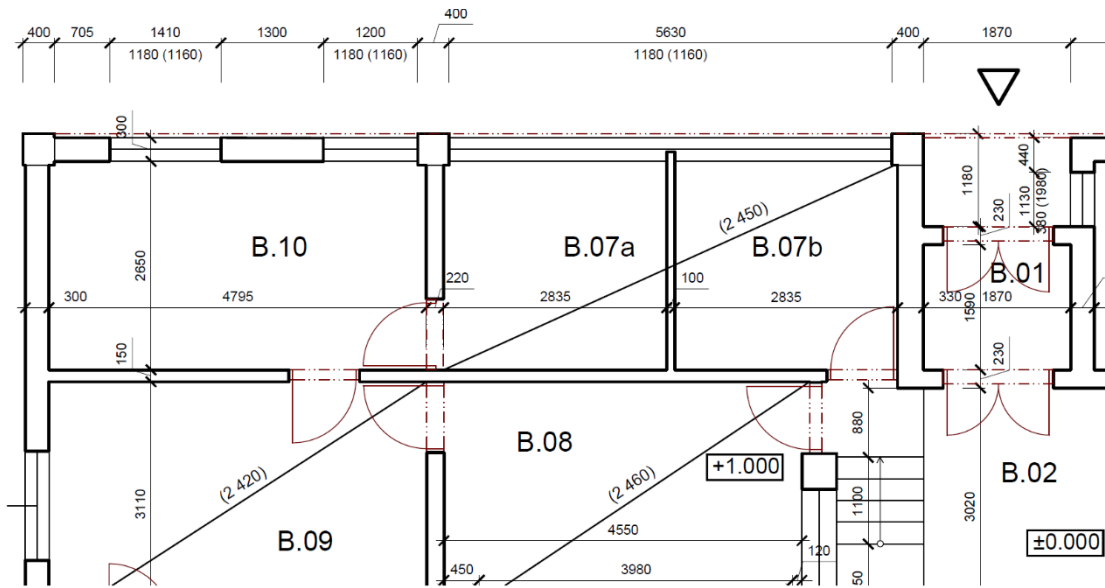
ALTERNATIVE 1 – FLOOR PLAN ADJUSTMENT FOR DEMO INSTALLATION
